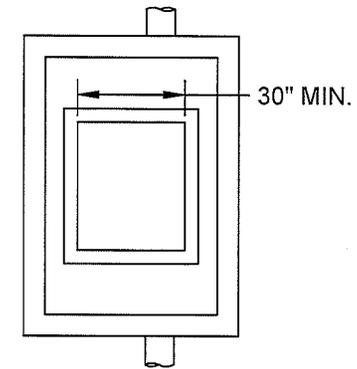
NTS	 CITY OF CHANDLER STANDARD DETAIL	3" THROUGH 6" RECLAIMED WATER METER VAULT	APPROVED: <i>John Hayes</i> CITY ENGINEER DATE: 01-27-11	DETAIL NO. C-416 NTS
